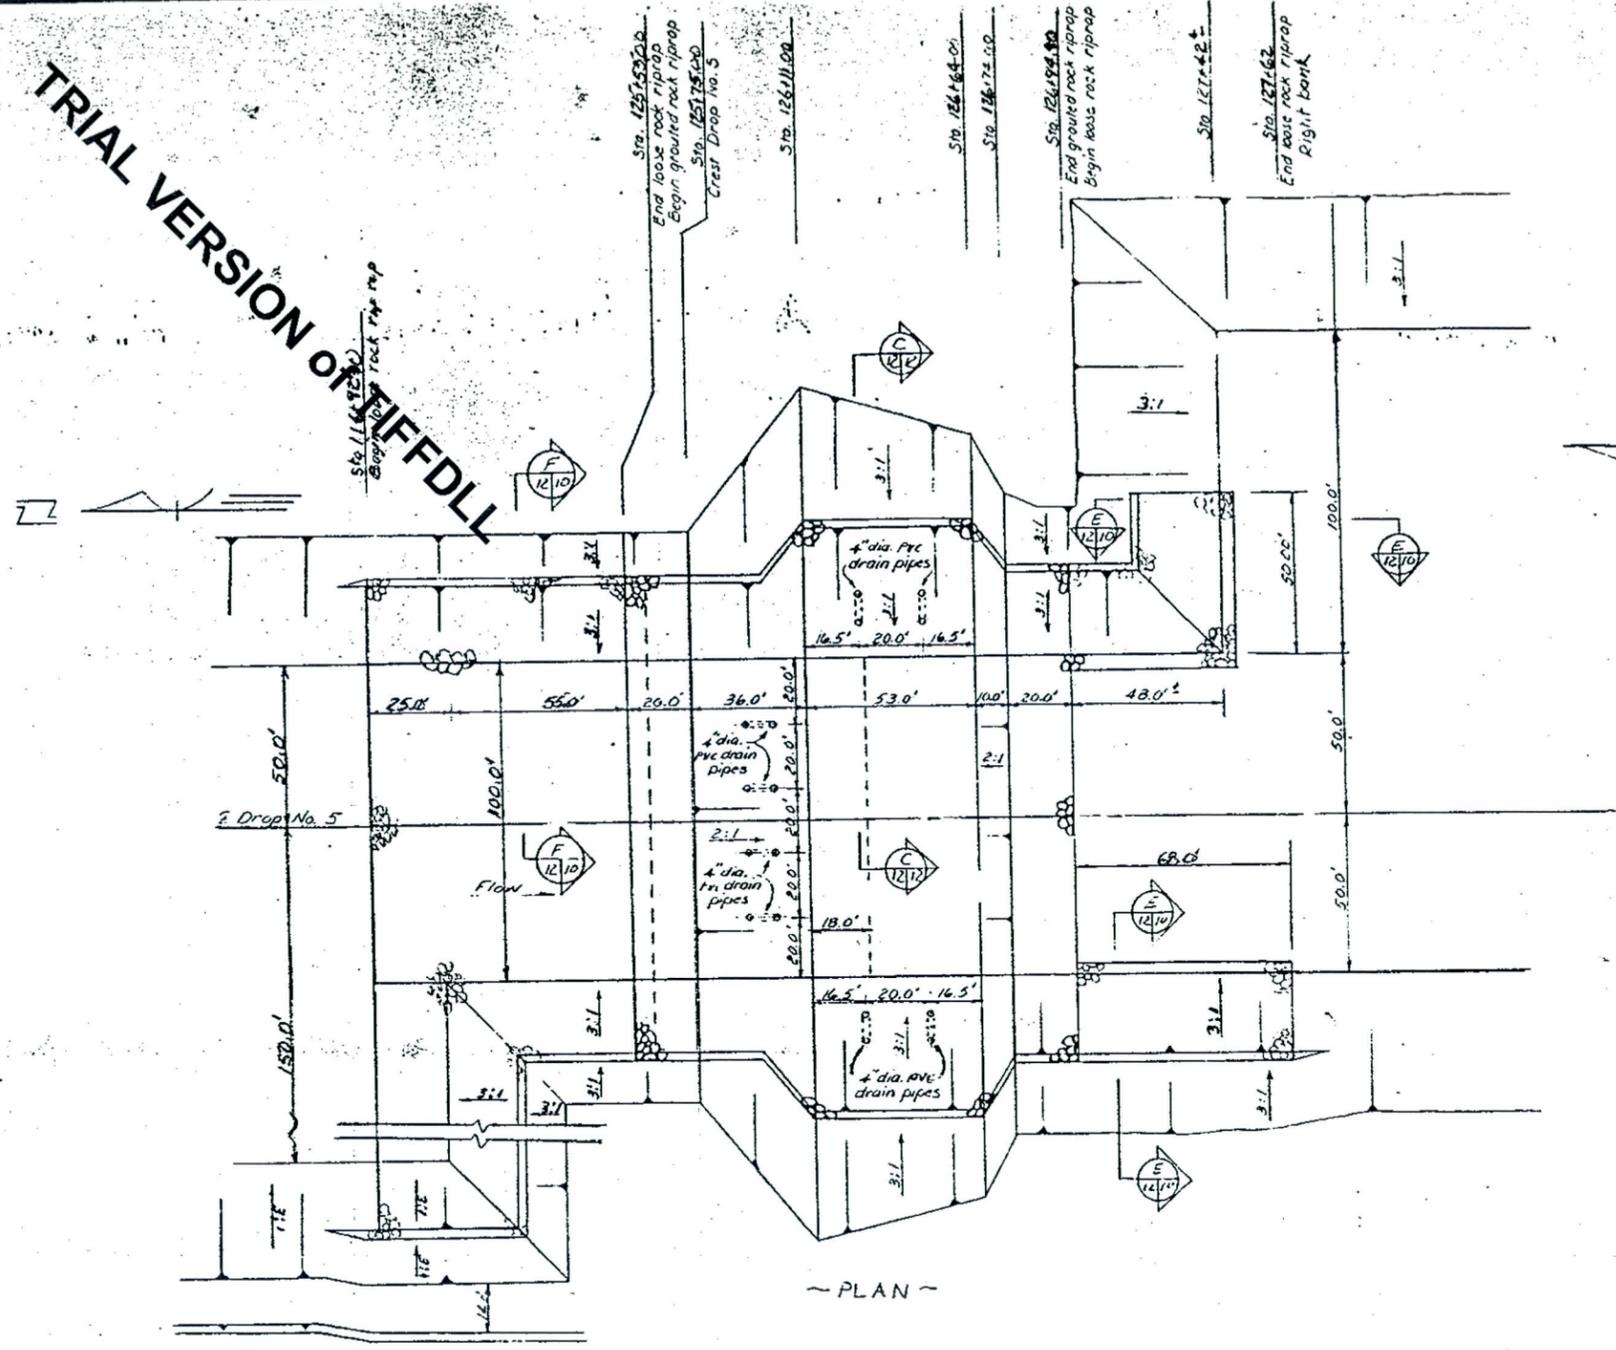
, B-11, B-12, B-13 (Not to scale)
